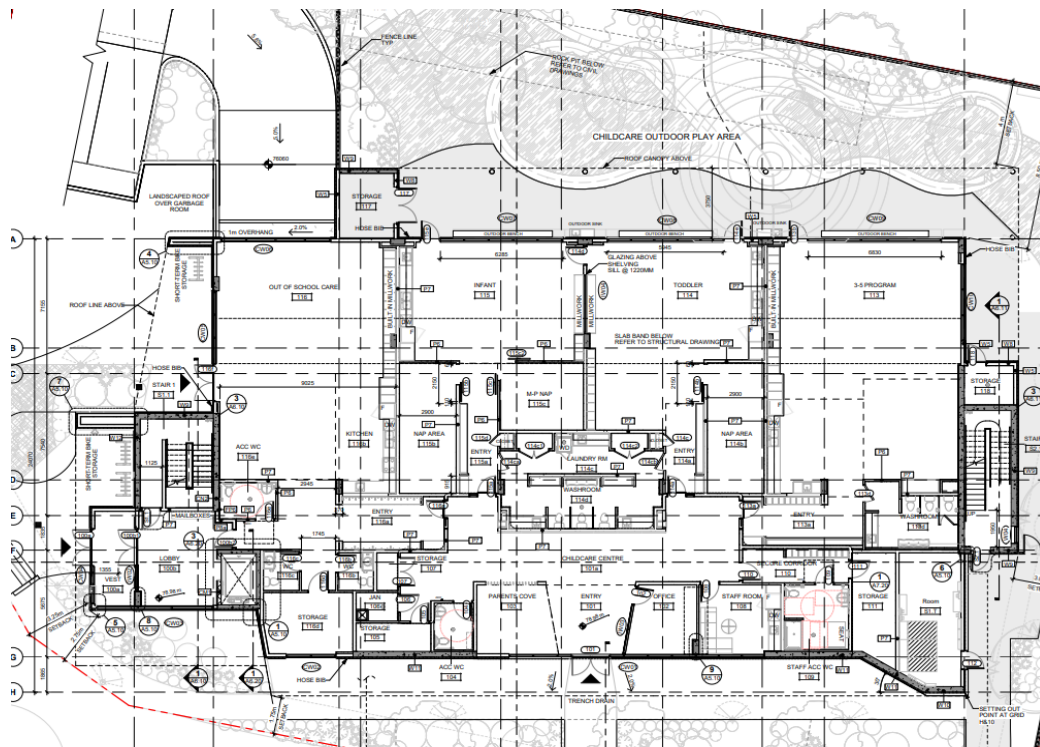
Ground Floor - Childcare (LHRA Issued for 75% Design February 3, 2026)
